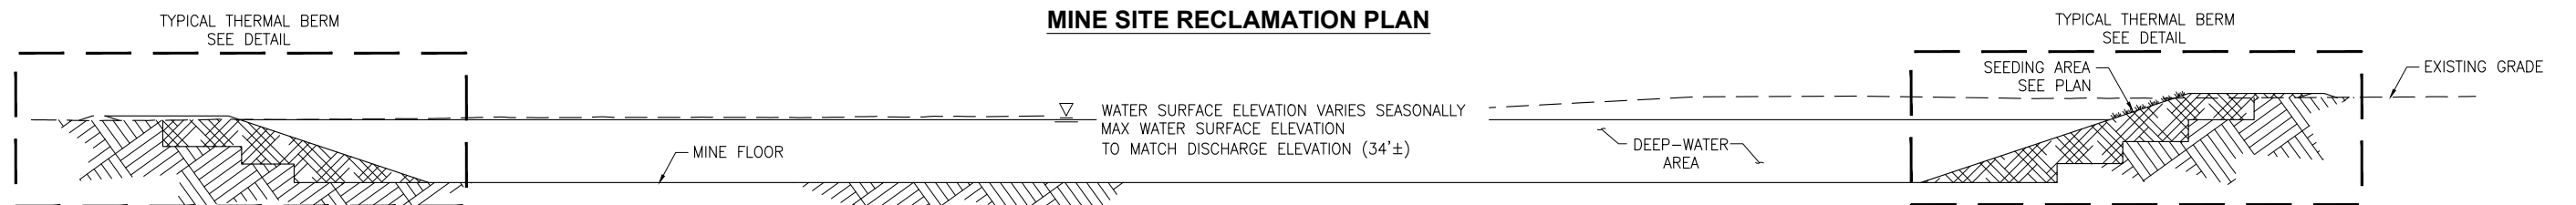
Willow Mine Site Reclamation Plan and Sections
